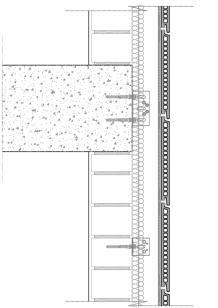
Vertical section. Faveton® SAH Ceram 28.
